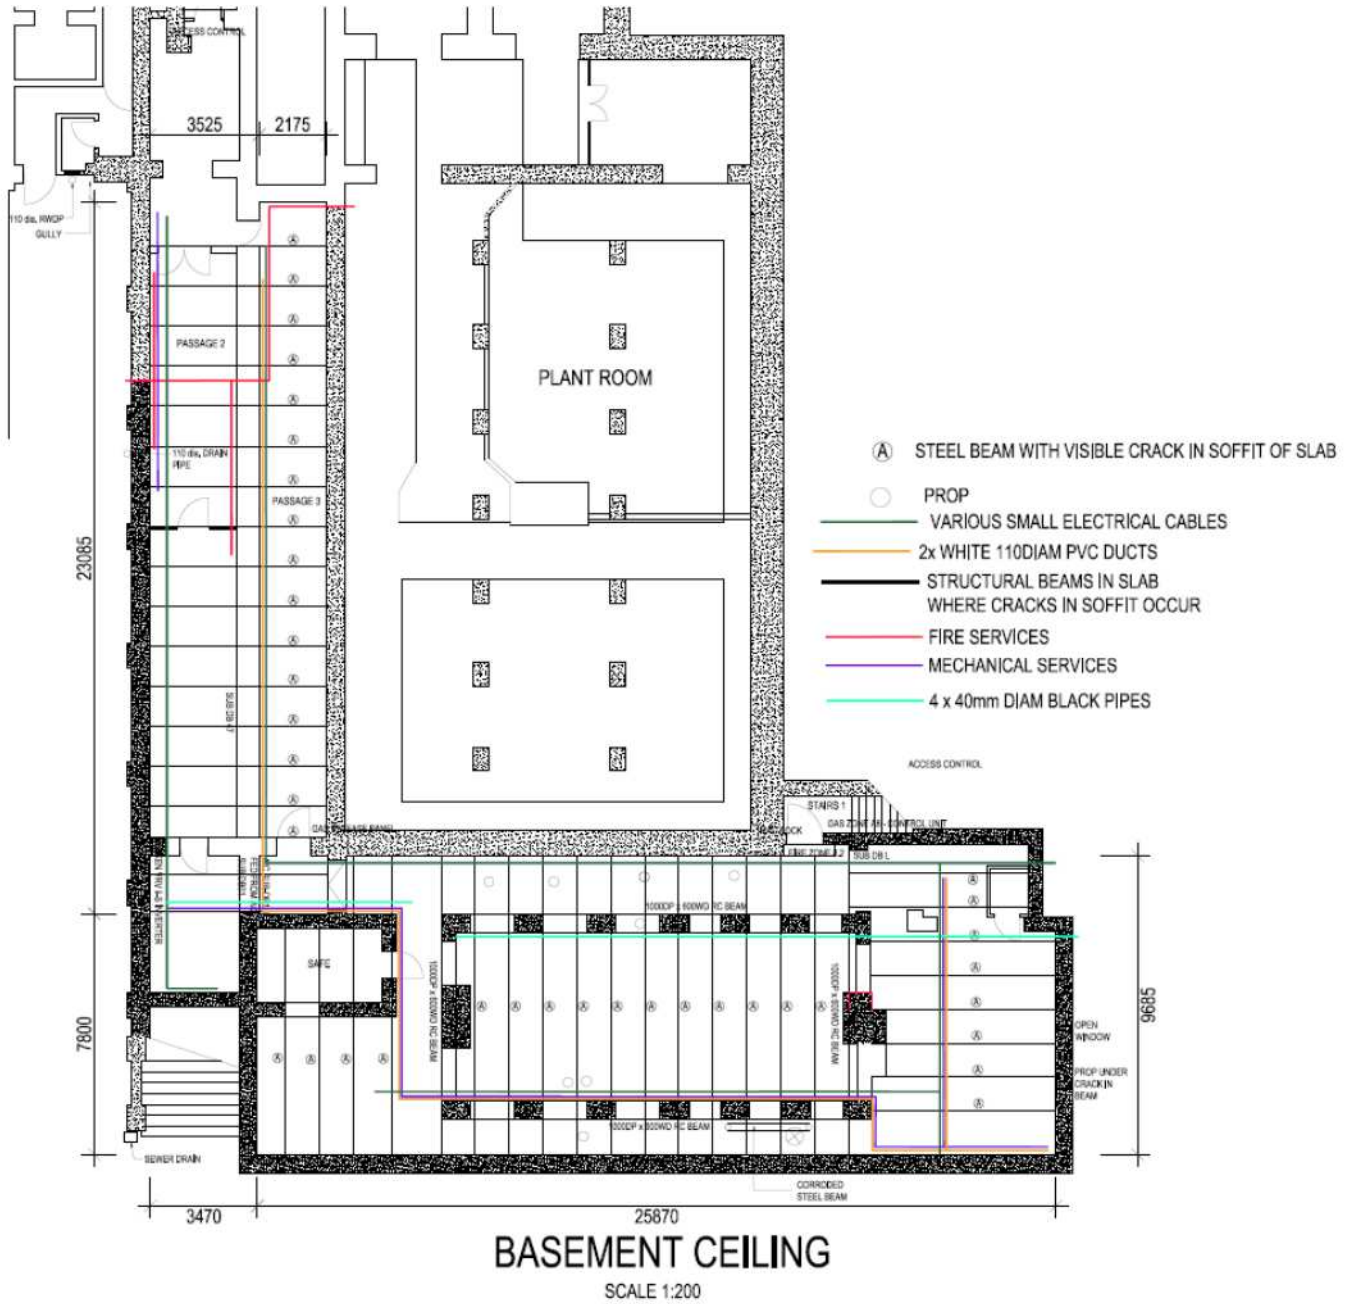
Layout drawing of basement with some of the service routes and approximate layout of the steel beams in the slab, based on the plaster cracks visible in the soffit of the slab.
